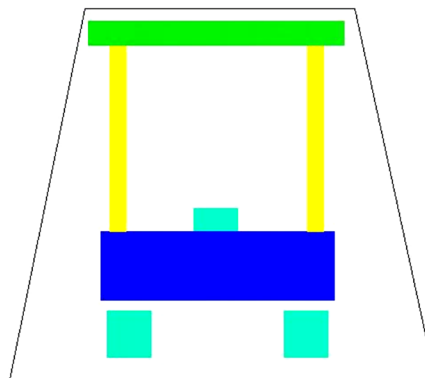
Schematic diagram of the trapezoidal roadway after the foundation of the comprehensive excavator
